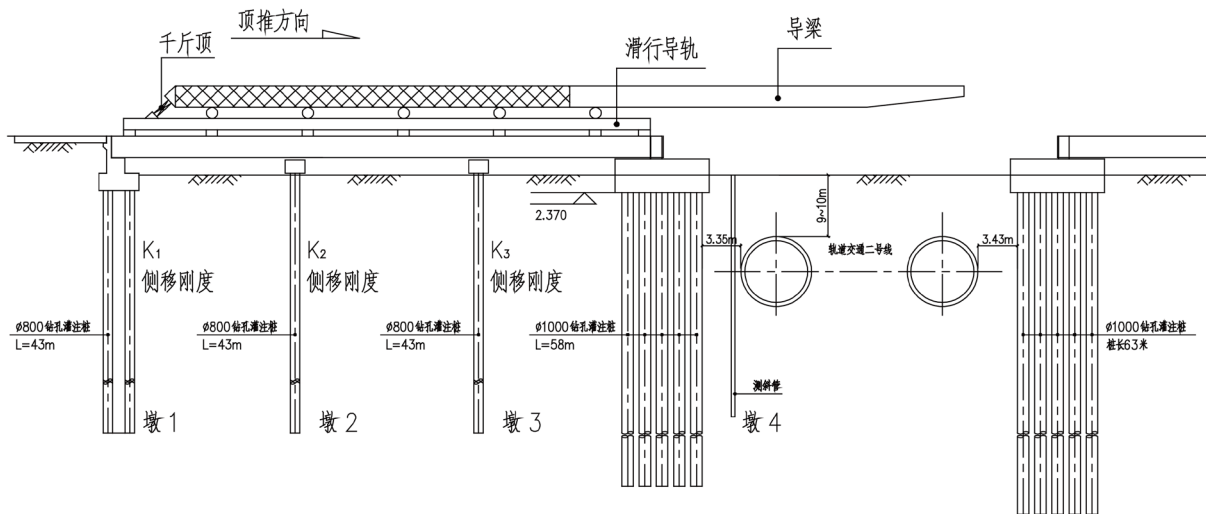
Sketch of a subway-crossing bridge by incremental launching
